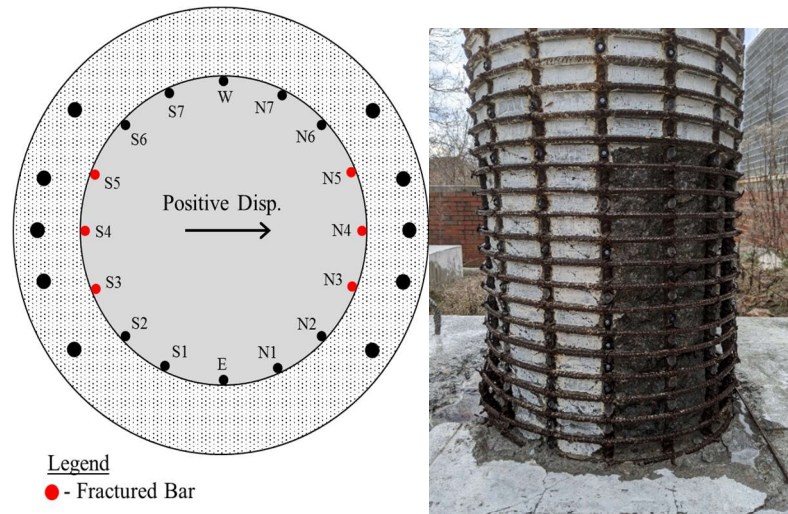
Repair cross section and conditions of chipped concrete for Repair #4.
